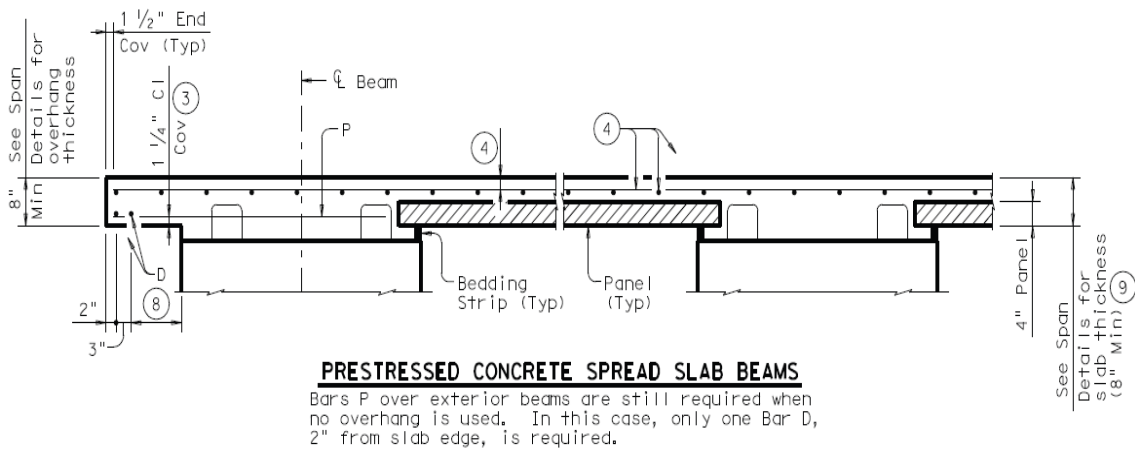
Typical Details of TxDOT Prestressed Concrete Spread Slab Beam Bridge Deck with PCPs (TxDOT 2012)
